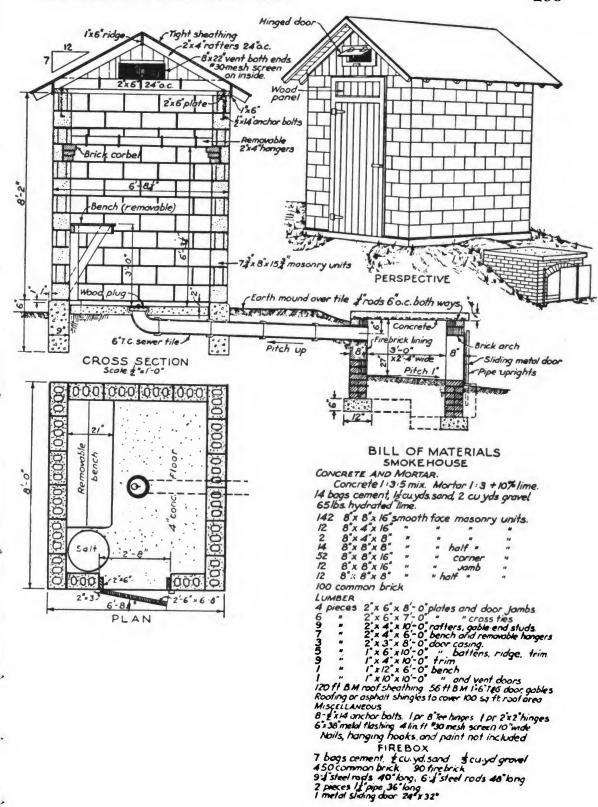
B. Drawing and bill of material for cement-block smokehouse.
